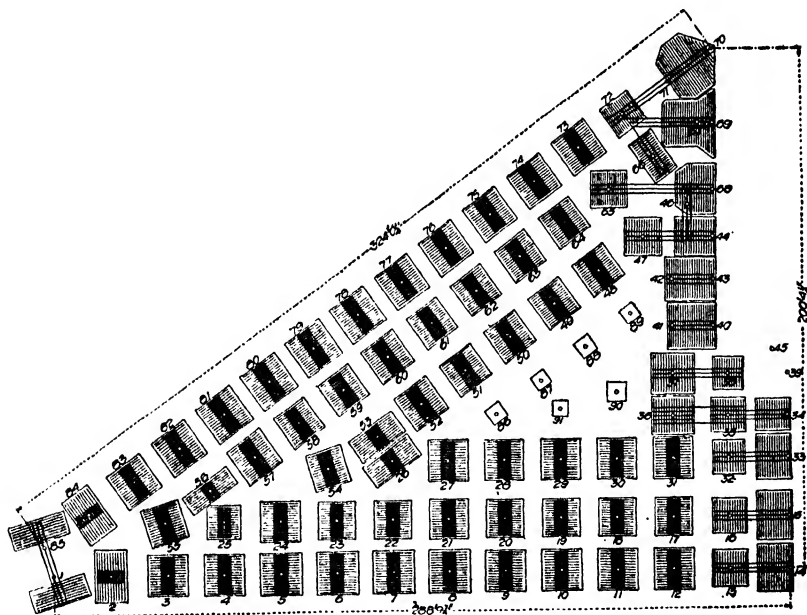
Grillage Plan of Phelan Building, San Francisco, Calif.
